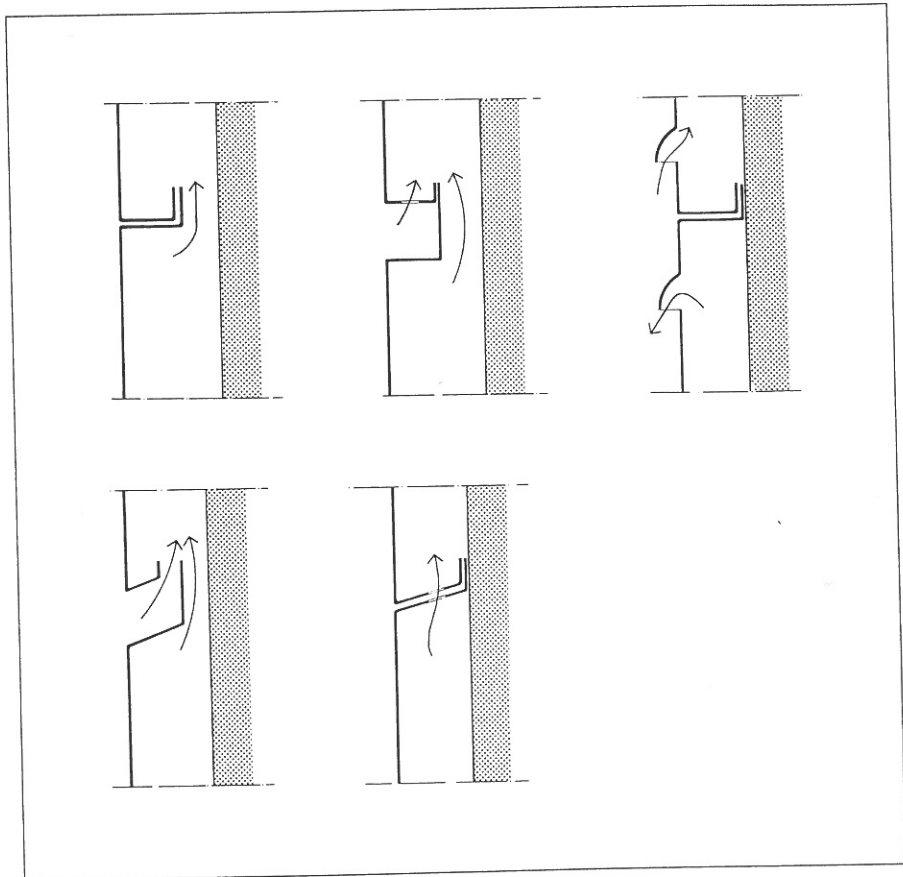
Examples of the ventilation of panel claddings, schematic drawing
